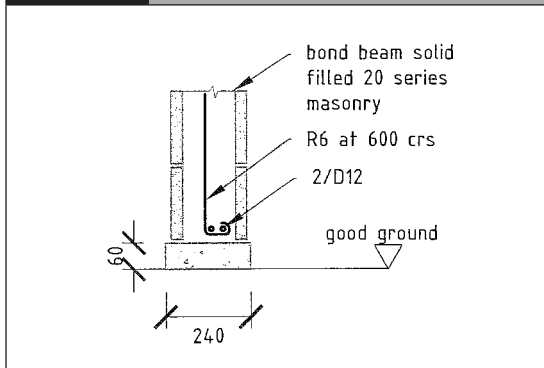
Foundation edge details – lightweight cladding
